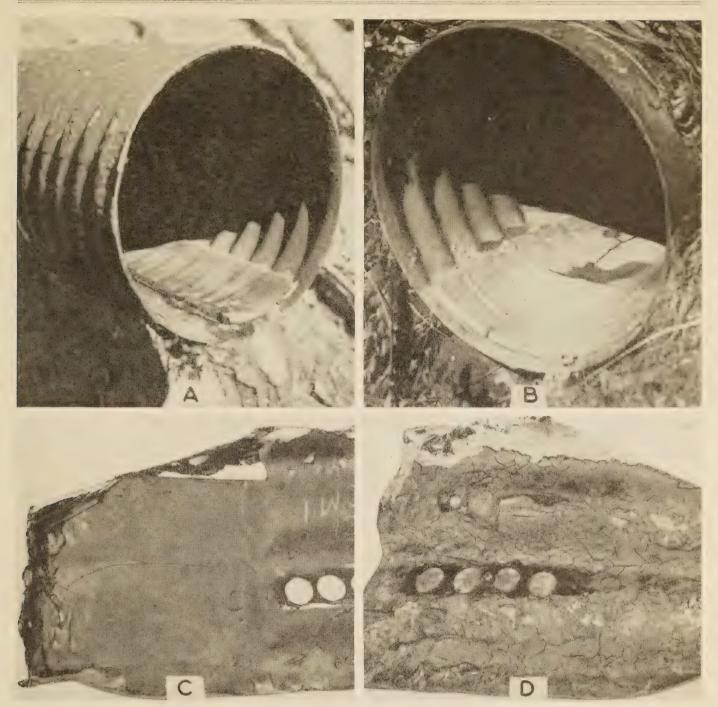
BITUMINOUS-COATED GALVANIZED METAL PIPE: (A) SEVERE LONGITUDINAL CRACKING; (B) CRACKING OF ASPHALT PAVEMENT; (C) INSIDE VIEW OF SAMPLE CUT FROM OUTLET END OF PIPE. CONDITION APPEARS TO BE GOOD BUT ADHESION TEST (ROUND SPOTS) SHOWS LOW ADHESION; AND (D) OUTSIDE OF SAMPLE SHOWN IN (C). THIS PORTION OF THE PIPE WAS IN CONTACT WITH SOIL. TESTS SHOWED POOR ADHESION.
